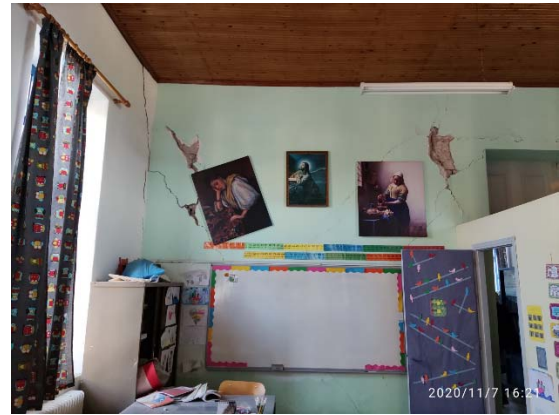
Primary school at Kontakeika: Major shear failure at the masonry walls, delamination of coating and overturning of equipment.
